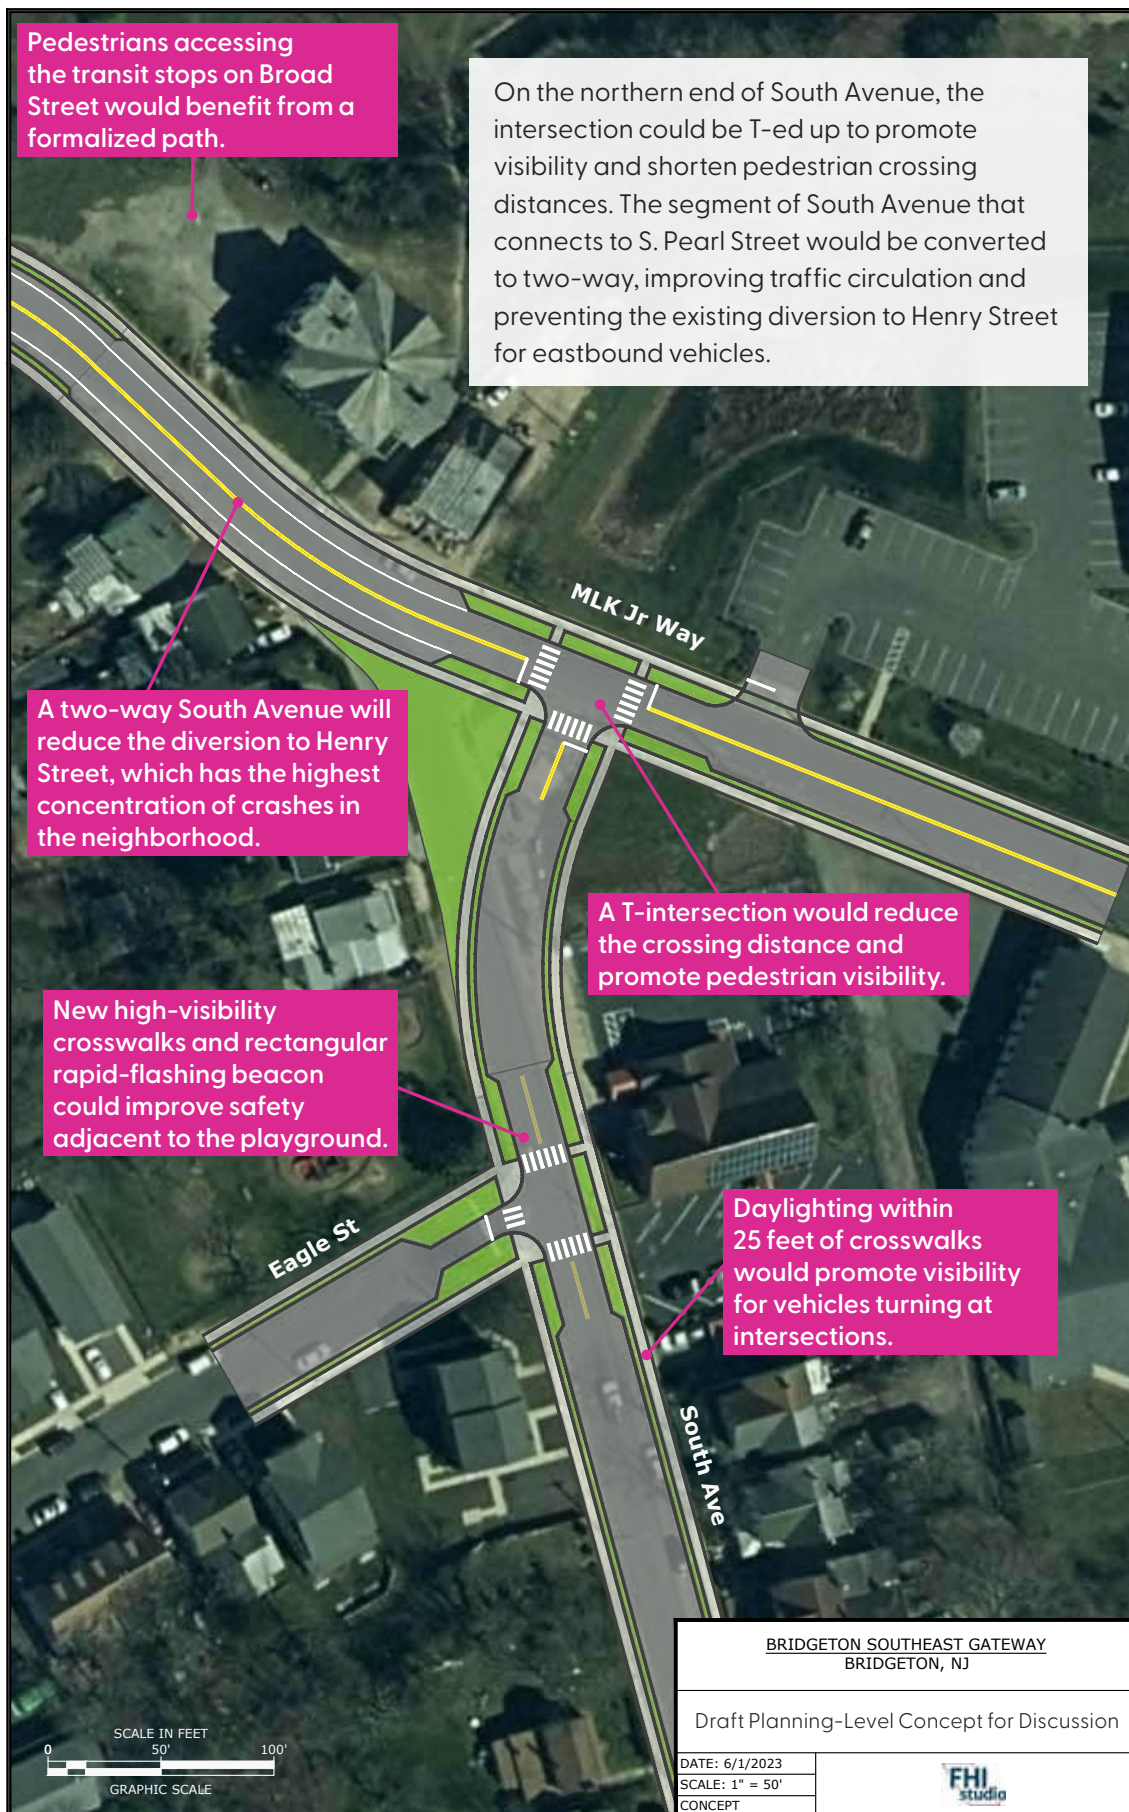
Grove St at Pearl St and South Ave Two-Way Concept Plan
